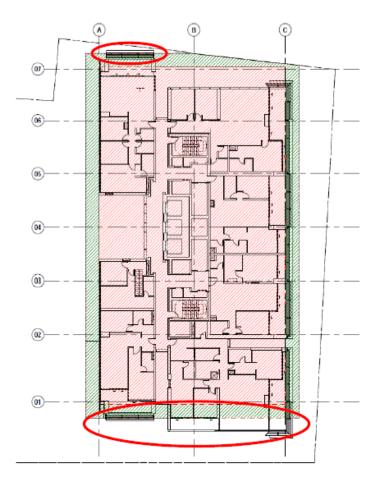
Typical floor plan showing changes between approved and proposed building envelopes
